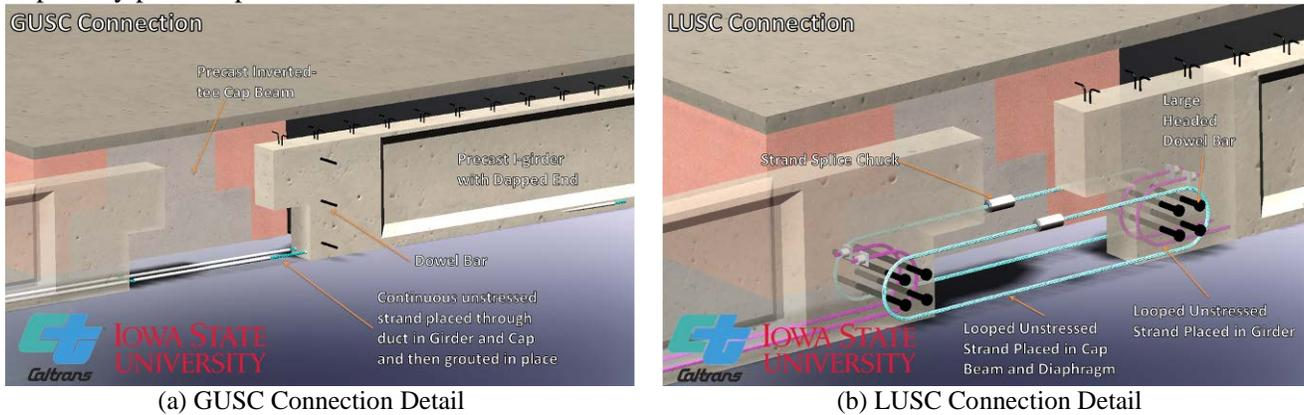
Schematic of Two Connections used between Precast I-shaped Girders and Precast Inverted-tee Cap Beam
